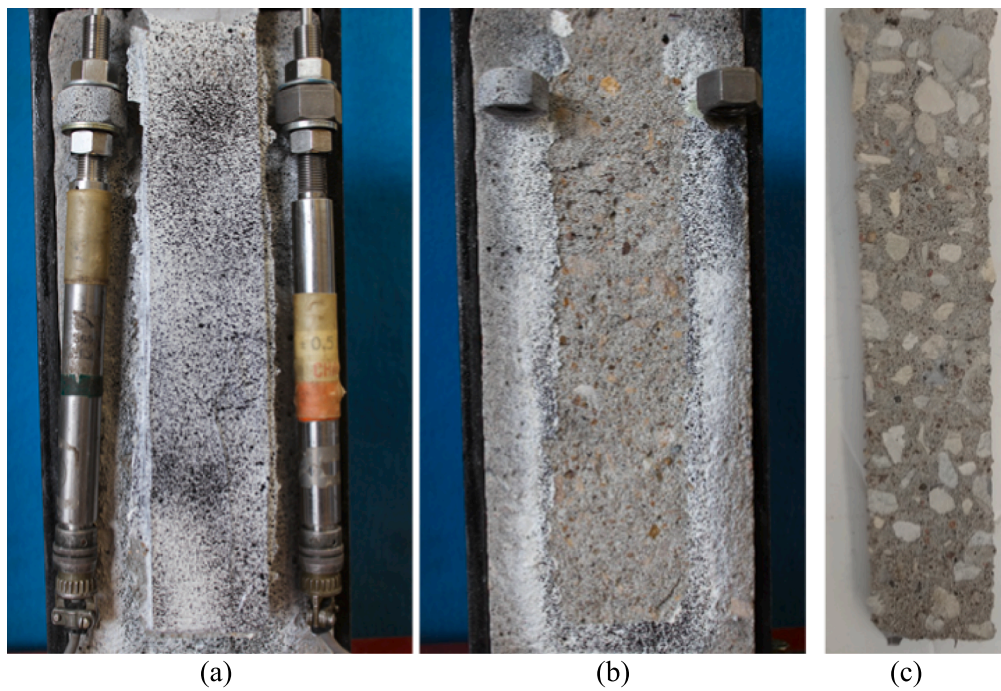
Failure mode of control specimen C\_1: (a) SRP plate separated from concrete substrate, (b) concrete substrate surface, and (c) back of SRP plate after debonding.
